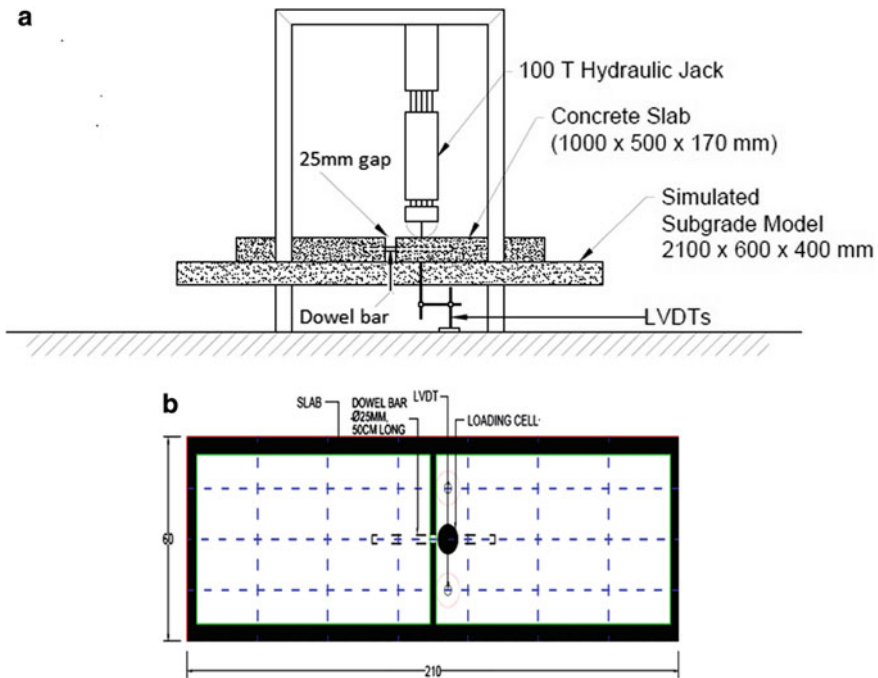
a Elevation of testing set-up of slab specimen. b Plan of testing set-up of slab specimen
